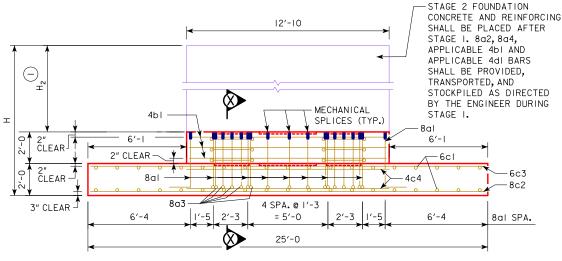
DETAIL S ANCHOR BOLT AND ANCHOR REINFORCING LOCATION KEYWAY NOT SHOWN
